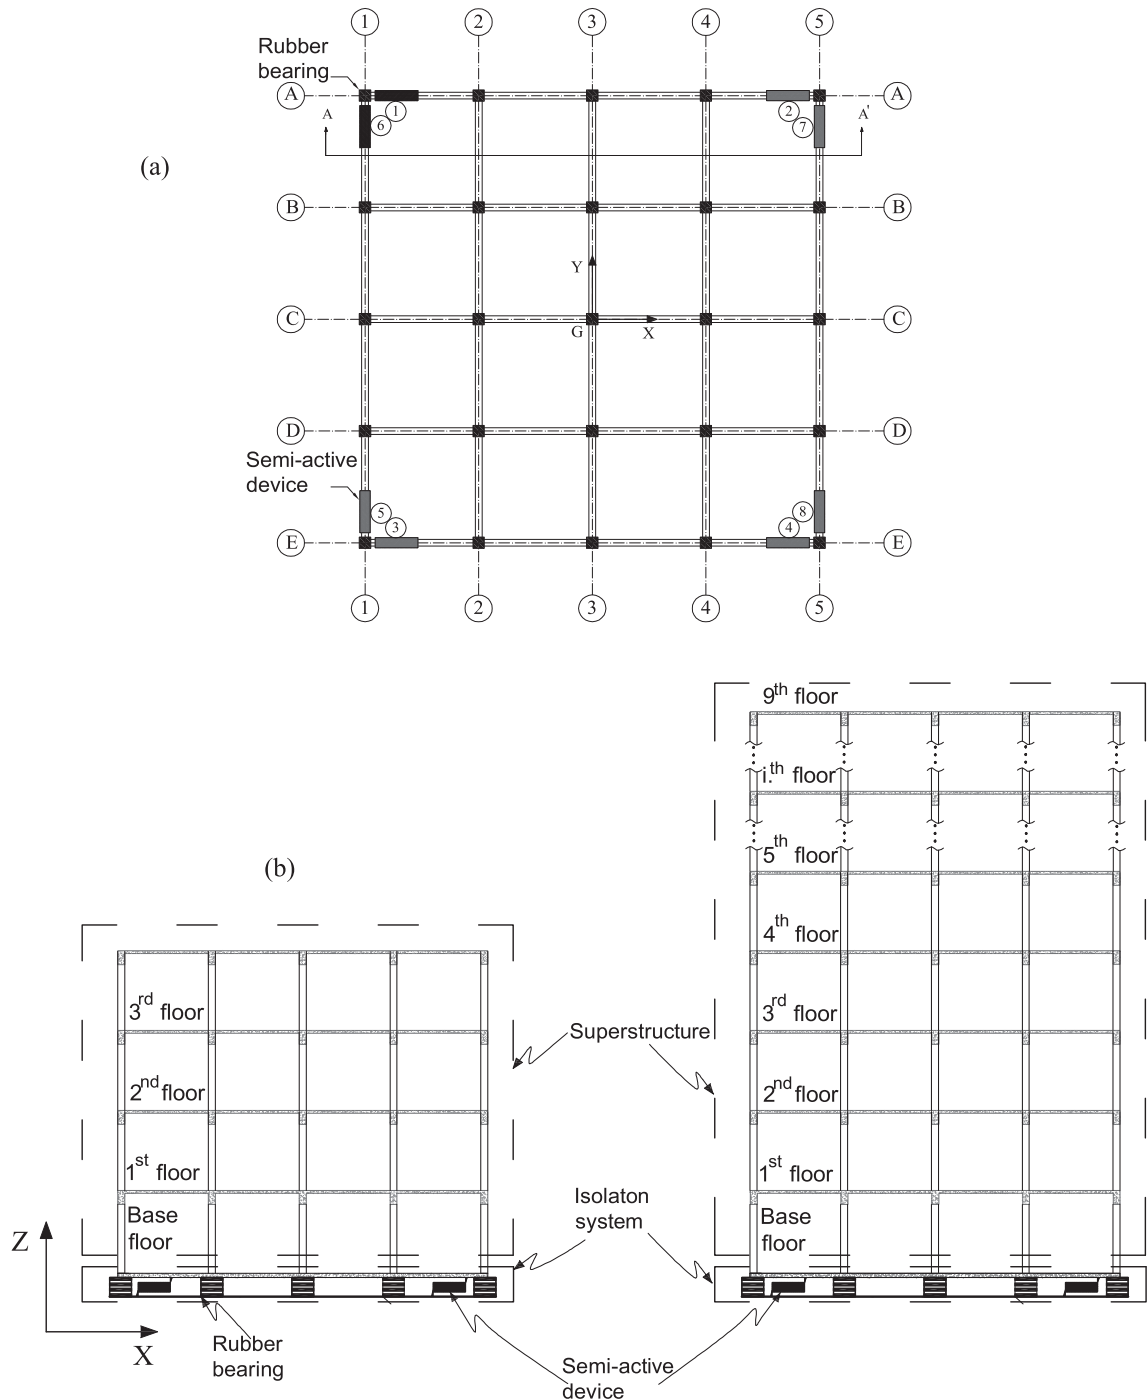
Benchmark 3-story and 9-story buildings: (a) plan view, (b) sectional view.
